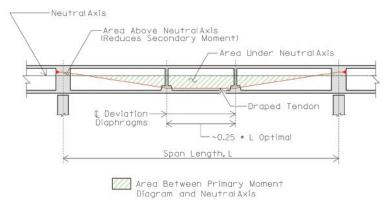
Draped post-tensioning tendon layout for a concrete segmental bridge constructed using the span-by-span method.
